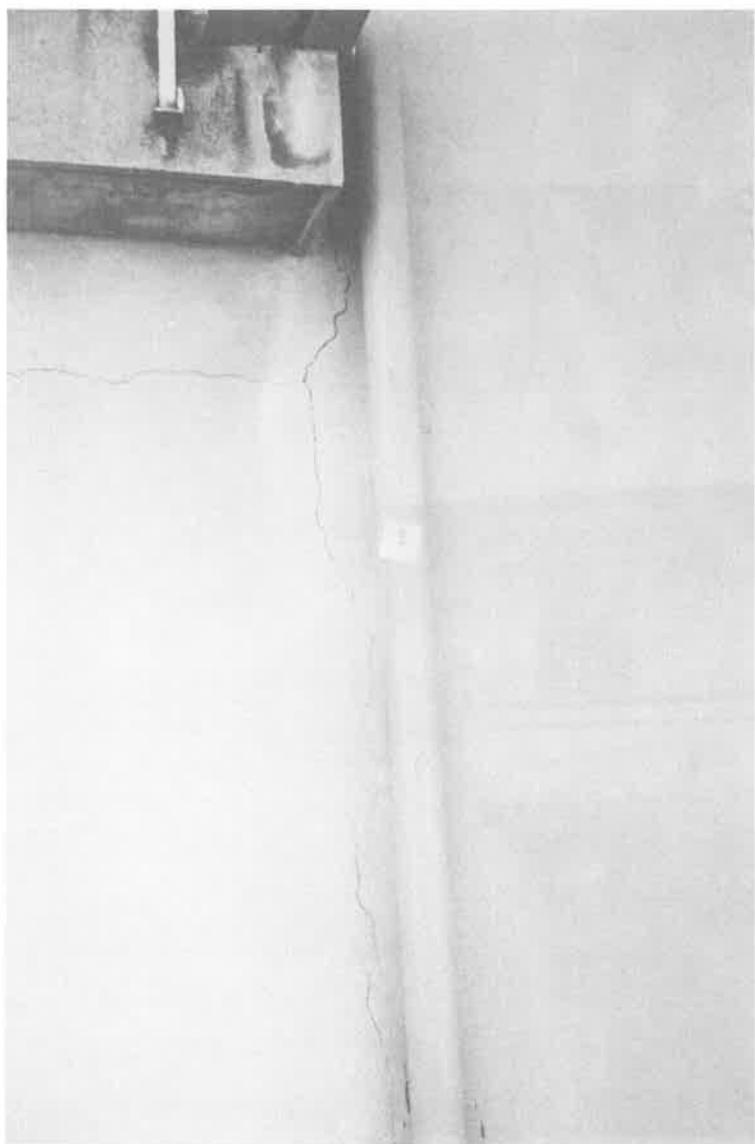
Hairline tracks appeared also in recently built constructions, as for example in the apartment block
